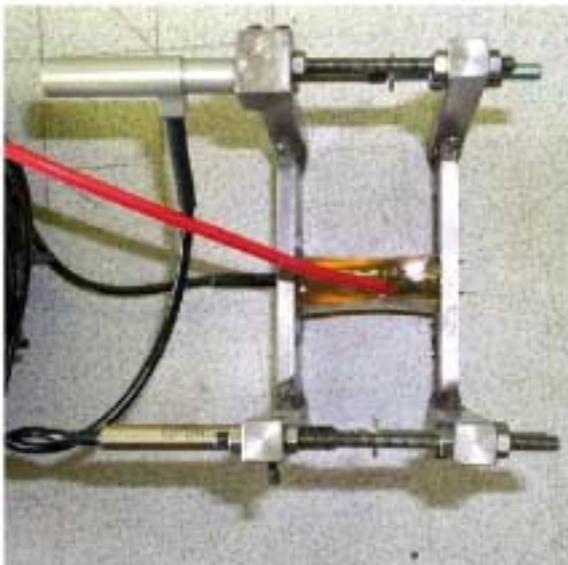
Layout of the instrumentation employed on beam for stage 2 (extension)
